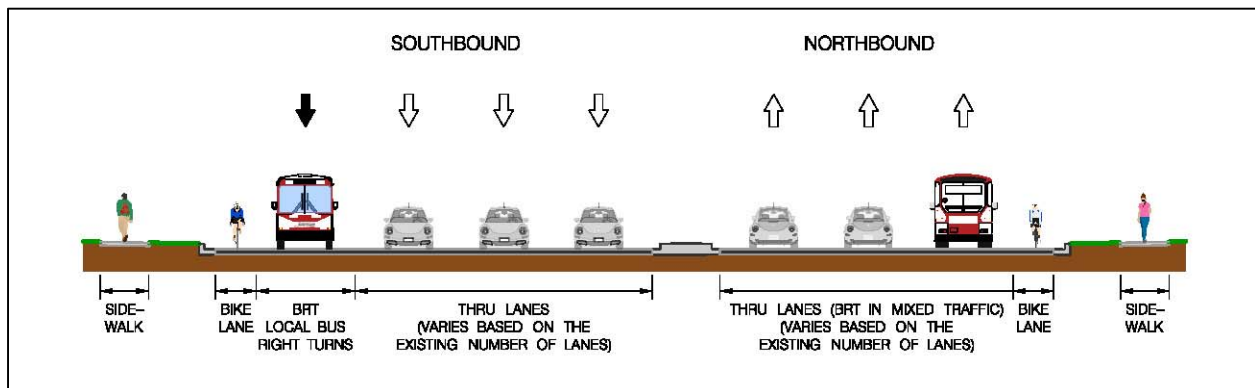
Alternative 4C - Section 2: Rockville / White Flint
